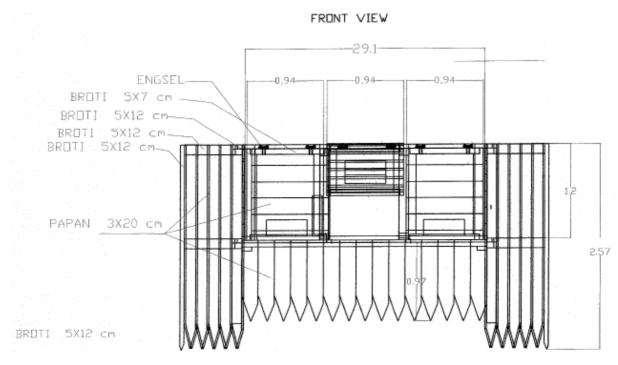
Standard Design of Flap Gate (Front View Drawing)
